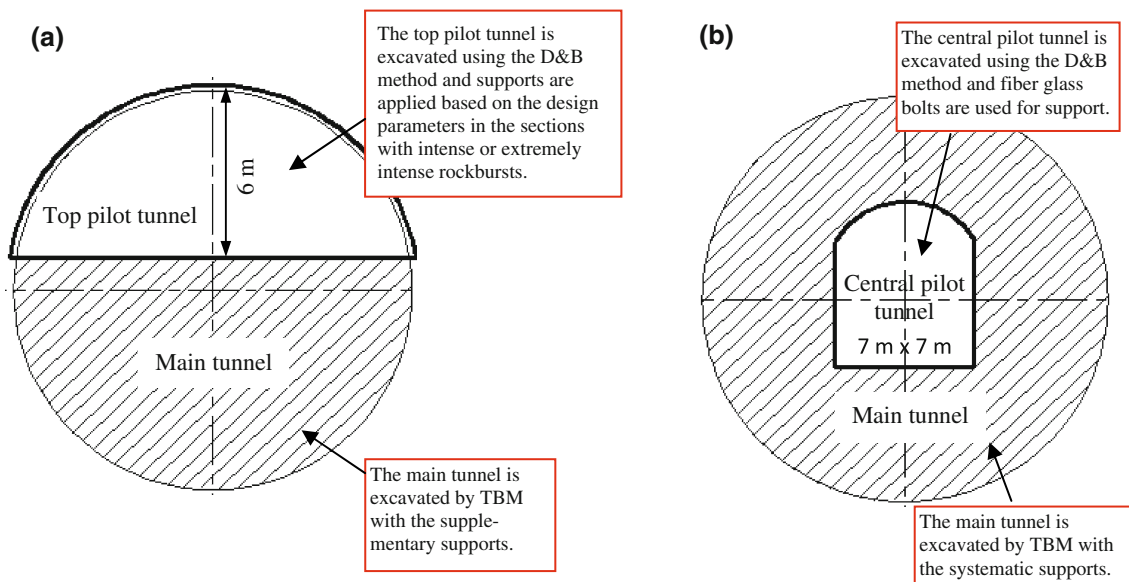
Schemes for: a the top pilot tunnel (no sidewalls) and b the central pilot tunnel
